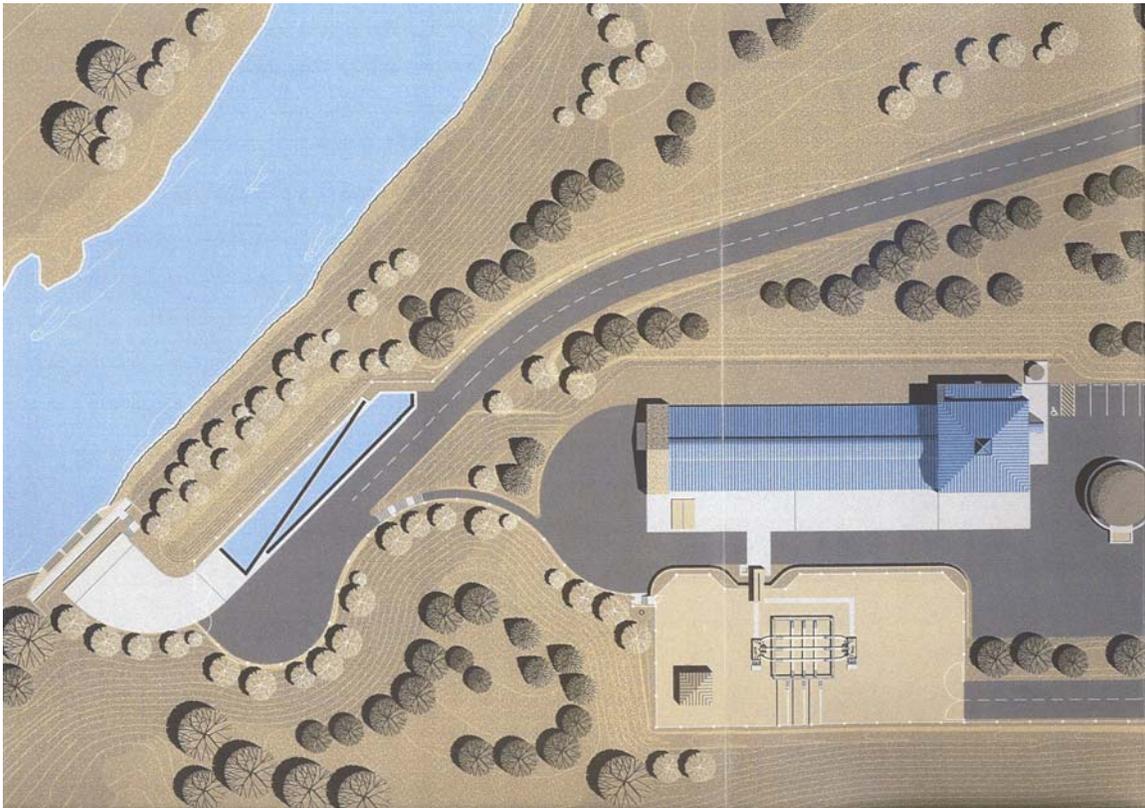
Plan DPP site rendition, (drawn by J. F Pattie, D-8120)
